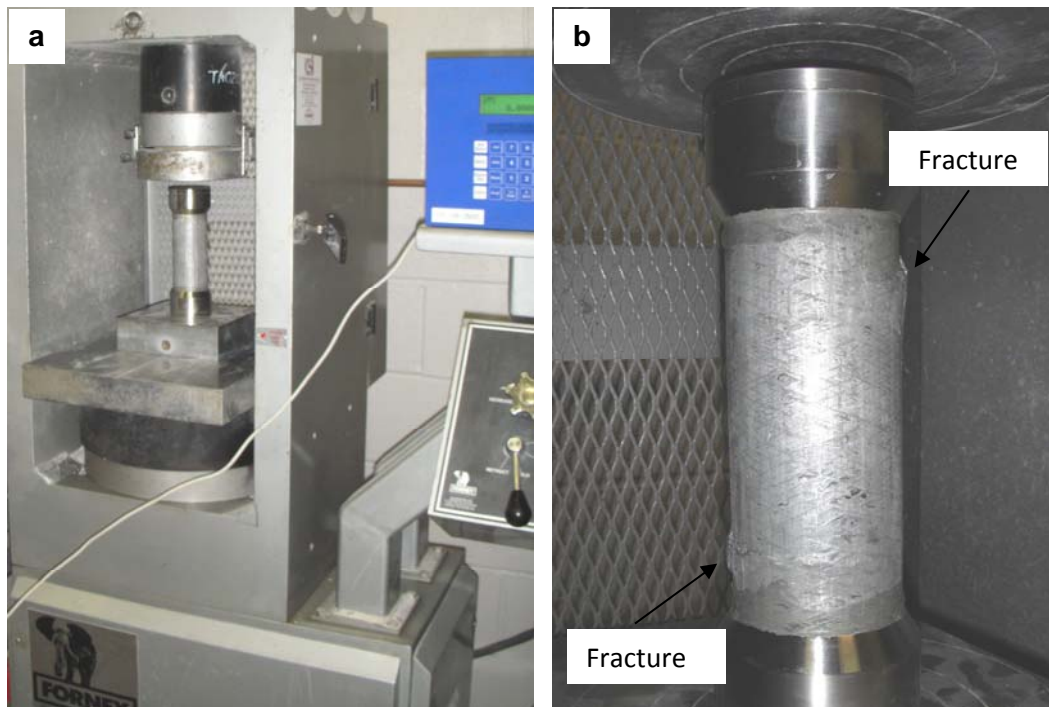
a) Forney compressive tester with 600,000-lb load capacity; and b) fractured specimen.
